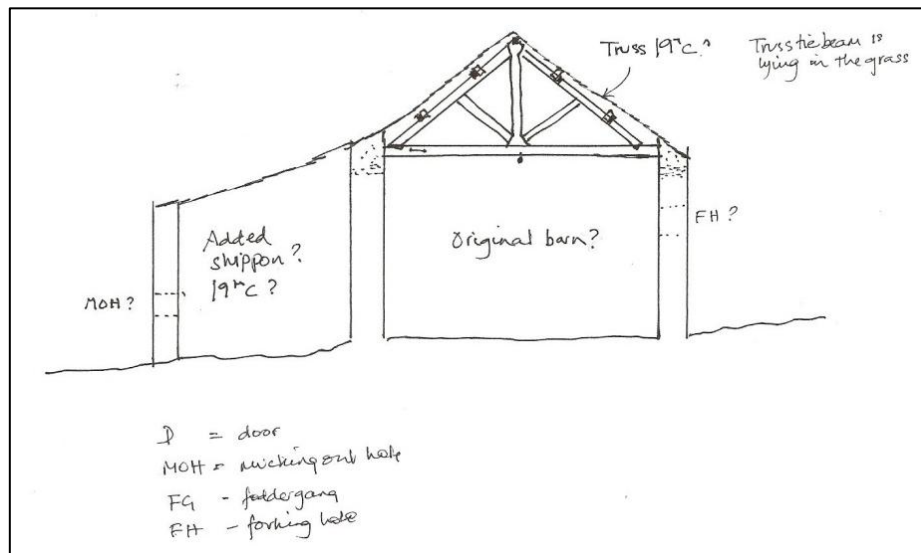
Thorns 5, 'reconstructed' section showing roof truss
